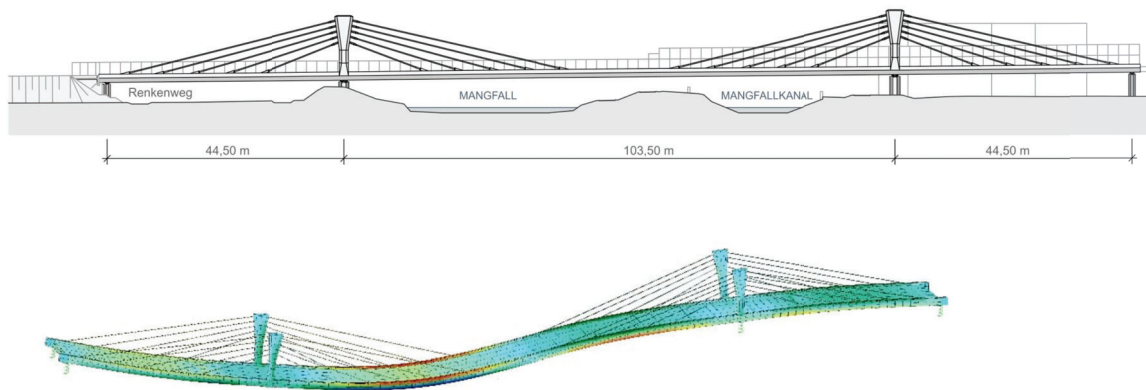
Side View of the Bridge and Calculation Model in one Settlement Load Case (©Ingenieurbüro Grassl GmbH)
